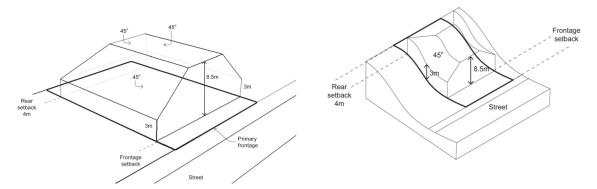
Permitted building envelope as required by provision 10.4.2 A3 (a) of the Interim Planning Scheme (flat site and sloping site⁵ version shown) (Source: Devonport Interim Planning Scheme 2013).
